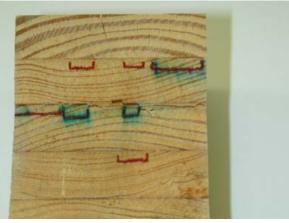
Figure A. Failure in ASTM D 2559 Specimen Bonded with Epoxy
